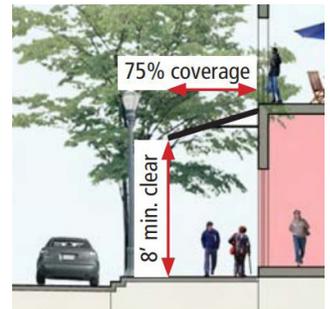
Awning section with minimum clear height above sidewalk & desired coverage.
